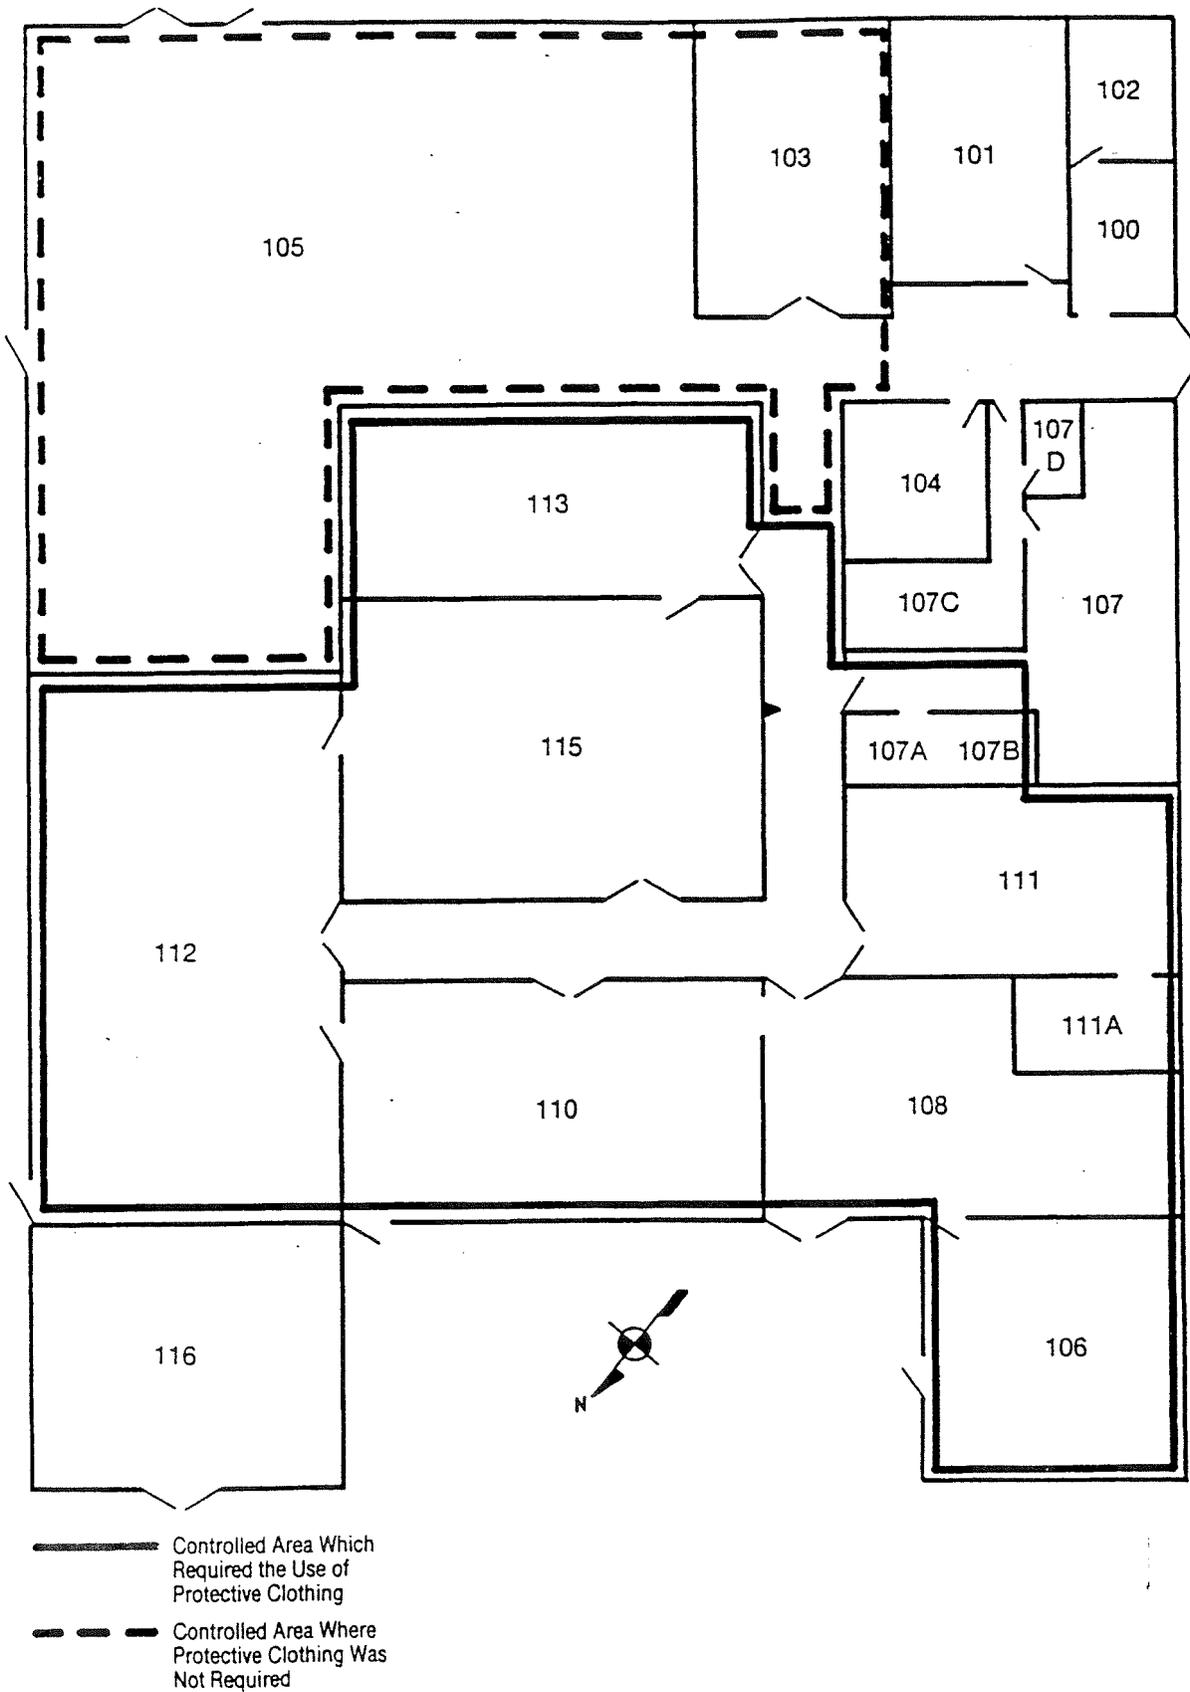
Building T005 Floor Plan Showing Controlled Areas
